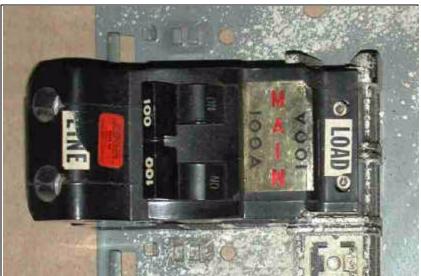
FPE 100-AMP MAIN BREAKER CONNECTS TO THE BUSSBARS THROUGH THE PLATE & POST CONFIGURATION, USING ONE SOCKET-HEAD 8-32 SCREW AT EACH TERMINAL TO ATTACH TO THE CONTACT PLATE.
